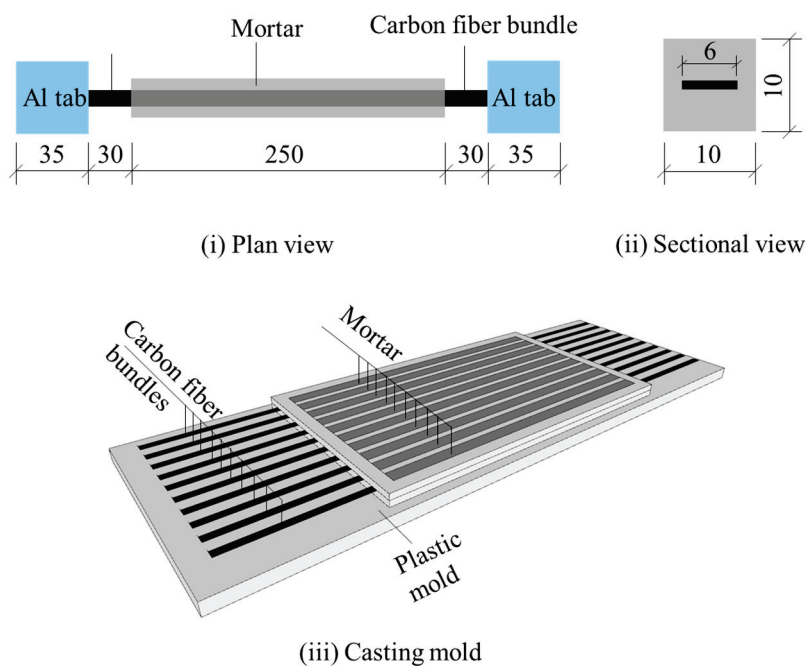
Geometrical details and casting mold for CFRCM composites (unit: mm).
